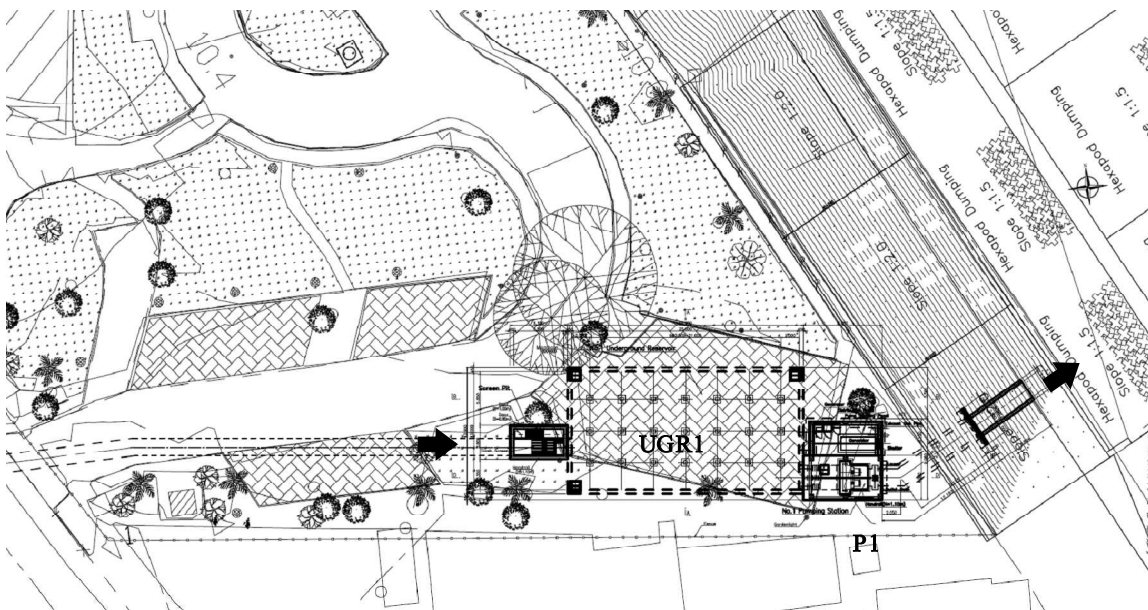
Layout of Underground Reservoir No. 1 and Pumping Station No. 1
